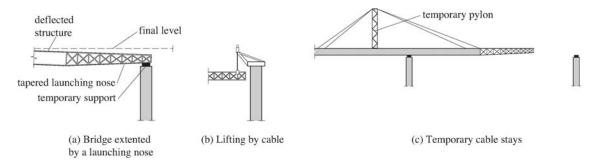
Compensation for the deflection of a launched cantilever as it arrives at a pier.
